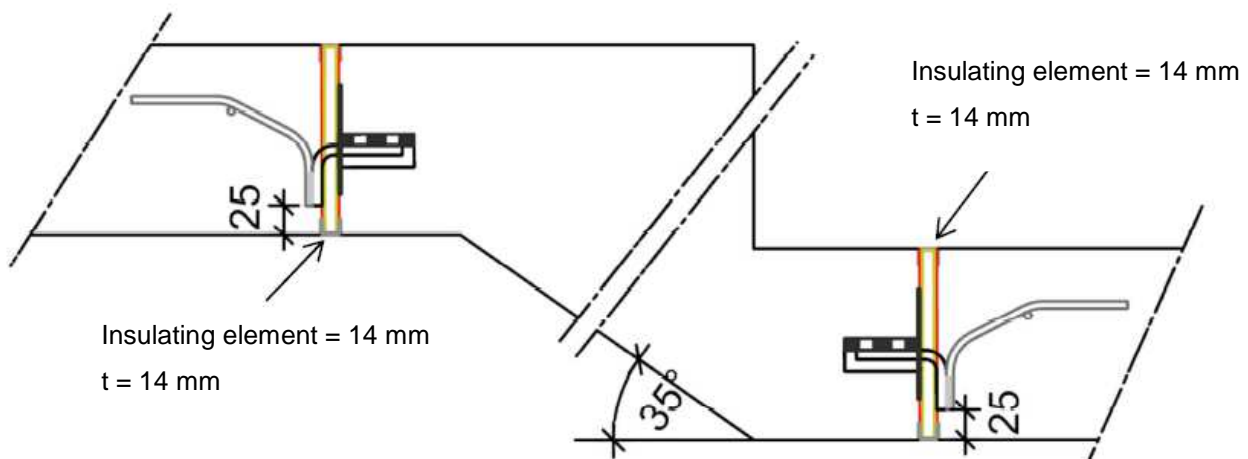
Installation situation with 14 mm thick insulating elements in the joints
